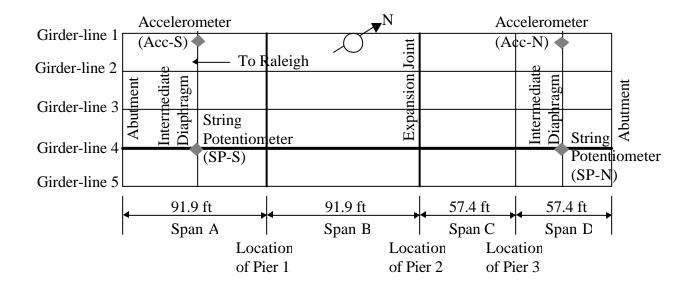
Locations Of String Potentiometers And Accelerometers Installed On The Bridge
